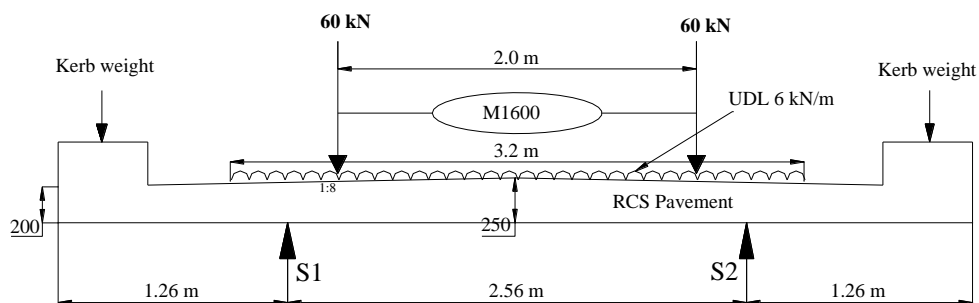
M1600 load centrally placed in the design of RCS pavement
